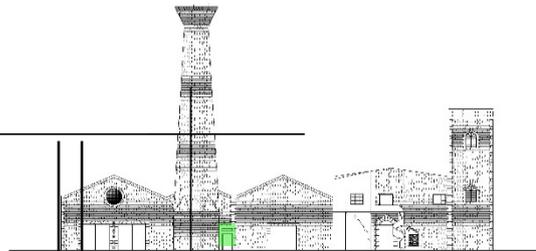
Encroachment - North-west Facade, between Chimney Tower and Barrack B, 15 to 17A, East Wharf, KPT, Karachi.
